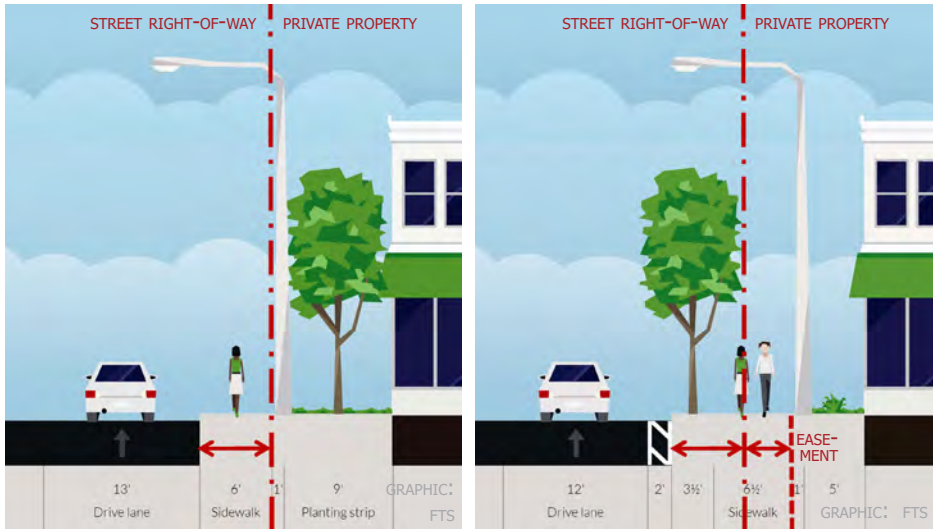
A.2 AND 3.1.5.A.3: SIDE-BY-SIDE VIEW OF EXISTING SIX FOOT WIDE SIDEWALK (LEFT) AND CONCEPTUAL SIDEWALK WIDENING (RIGHT) WITH 1’ LANE WIDTH REDUCTIONS AND 2’ BUFFER, ADDED TYPICAL CURBSIDE STREET TREES IN 3’X 6’ WELLS OR CONTINUOUS PLANTING STRIP, AND ADDED 4’ SIDEWALK WIDENING VIA PRIVATE PROPERTY EASEMENT (ALL WIDTHS DEPENDENT ON SITE CONDITIONS)
